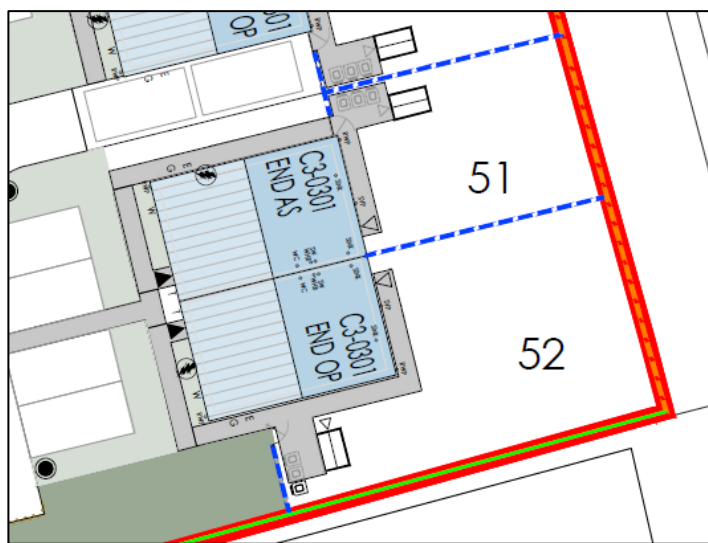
Previously Approved Site Layout (Dwg: BY00099-STH-B01-XX-DR-A SL001 Rev: O)
